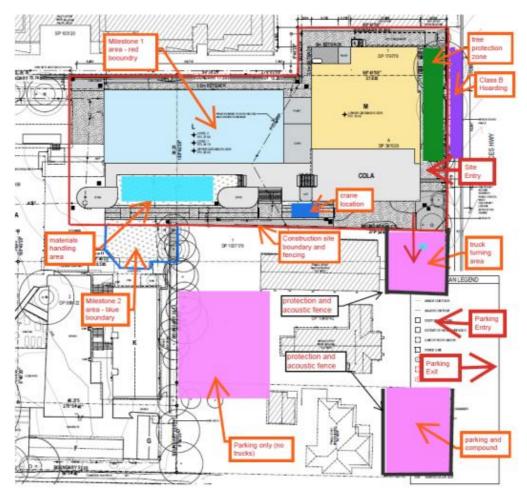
Proposed Construction Site Establishment Plan - Option utilising the Church (RP Infrastructure, 2025)
